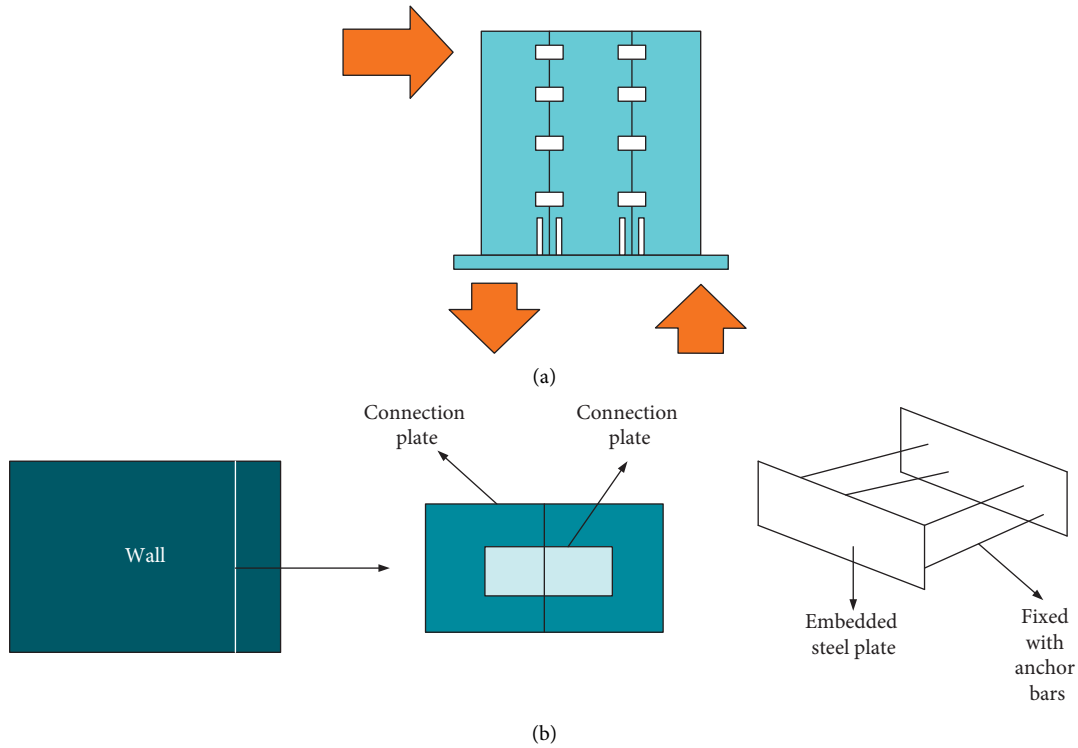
Vertical joint shear wall structure: (a) embedded position in steel plate bolt wall and (b) structure in fabricated shear wall.
